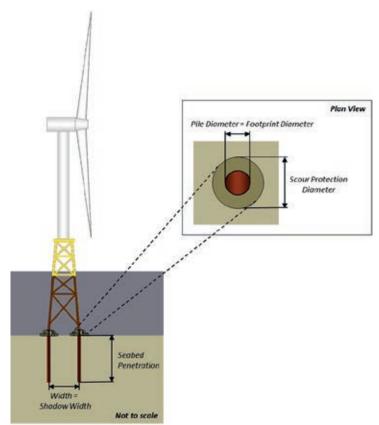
Illustrative Steel Framed Substructure with Pile Foundation
